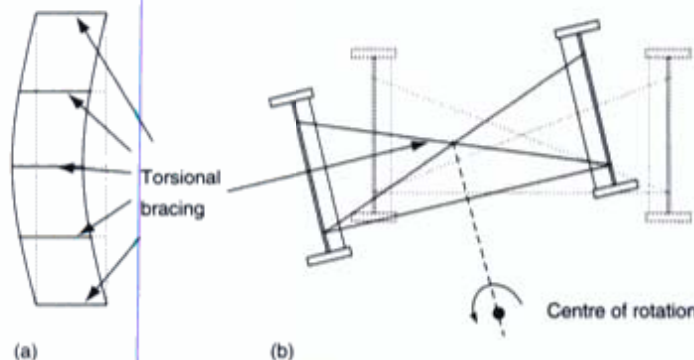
Torsional bracing and shape of buckling mode, for paired beams: (a) plan on braced pair of beams showing buckling mode shape; (b) cross-section through braced pair of beams showing buckling mode shape
